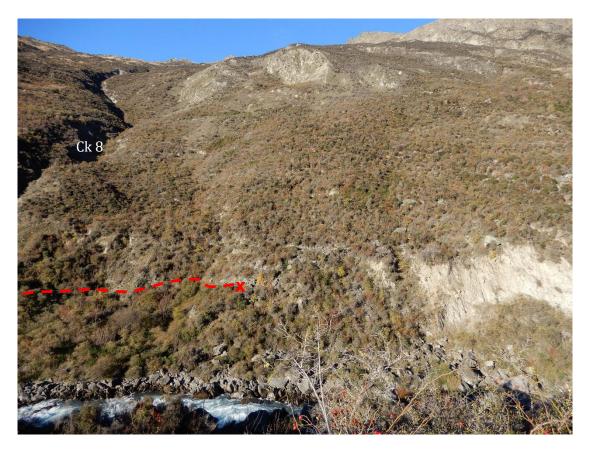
Section of trail between proposed Citroen Rapid Bridge true right abutment (red cross) and Creek 8. Note active scarps just below skyline and upstream of site and also incipient scarps just above abutment.
